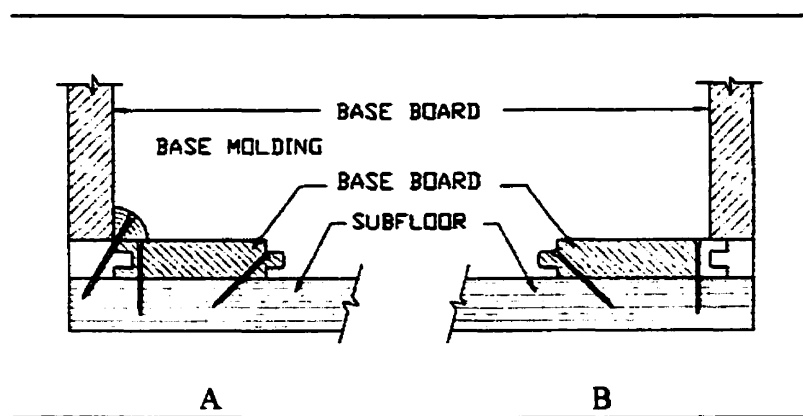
Section showing nailing detail for first strip of finish floor. A: with base molding. B: without base molding. Face nails in B may be countersunk and the holes filled with plastic wood. (Author)
